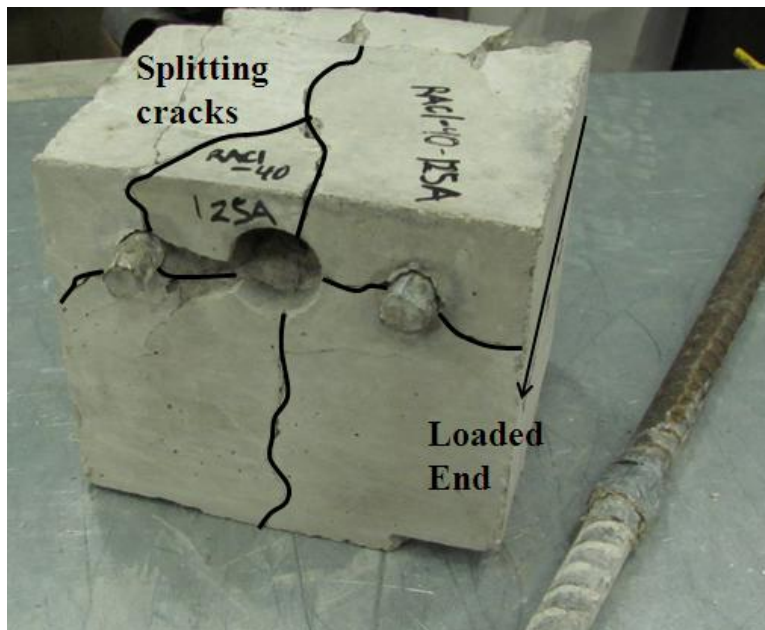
Main anchorage zone and splitting crack pattern (dissected BE-RAC1-40-125A)
